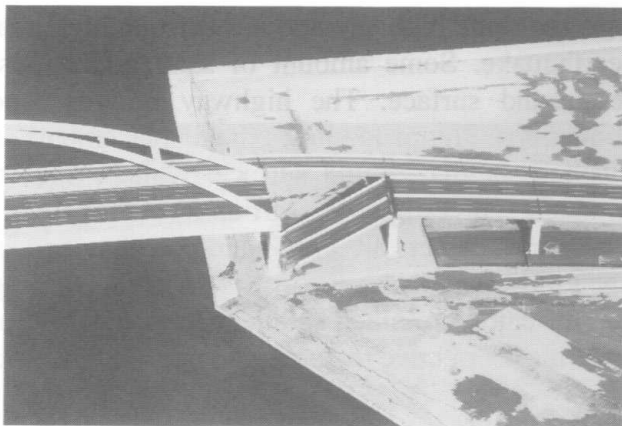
Steel girder of Nishinomiya-ko Bridge dropped due to liquefaction and inertia force (A in Figure 17)
